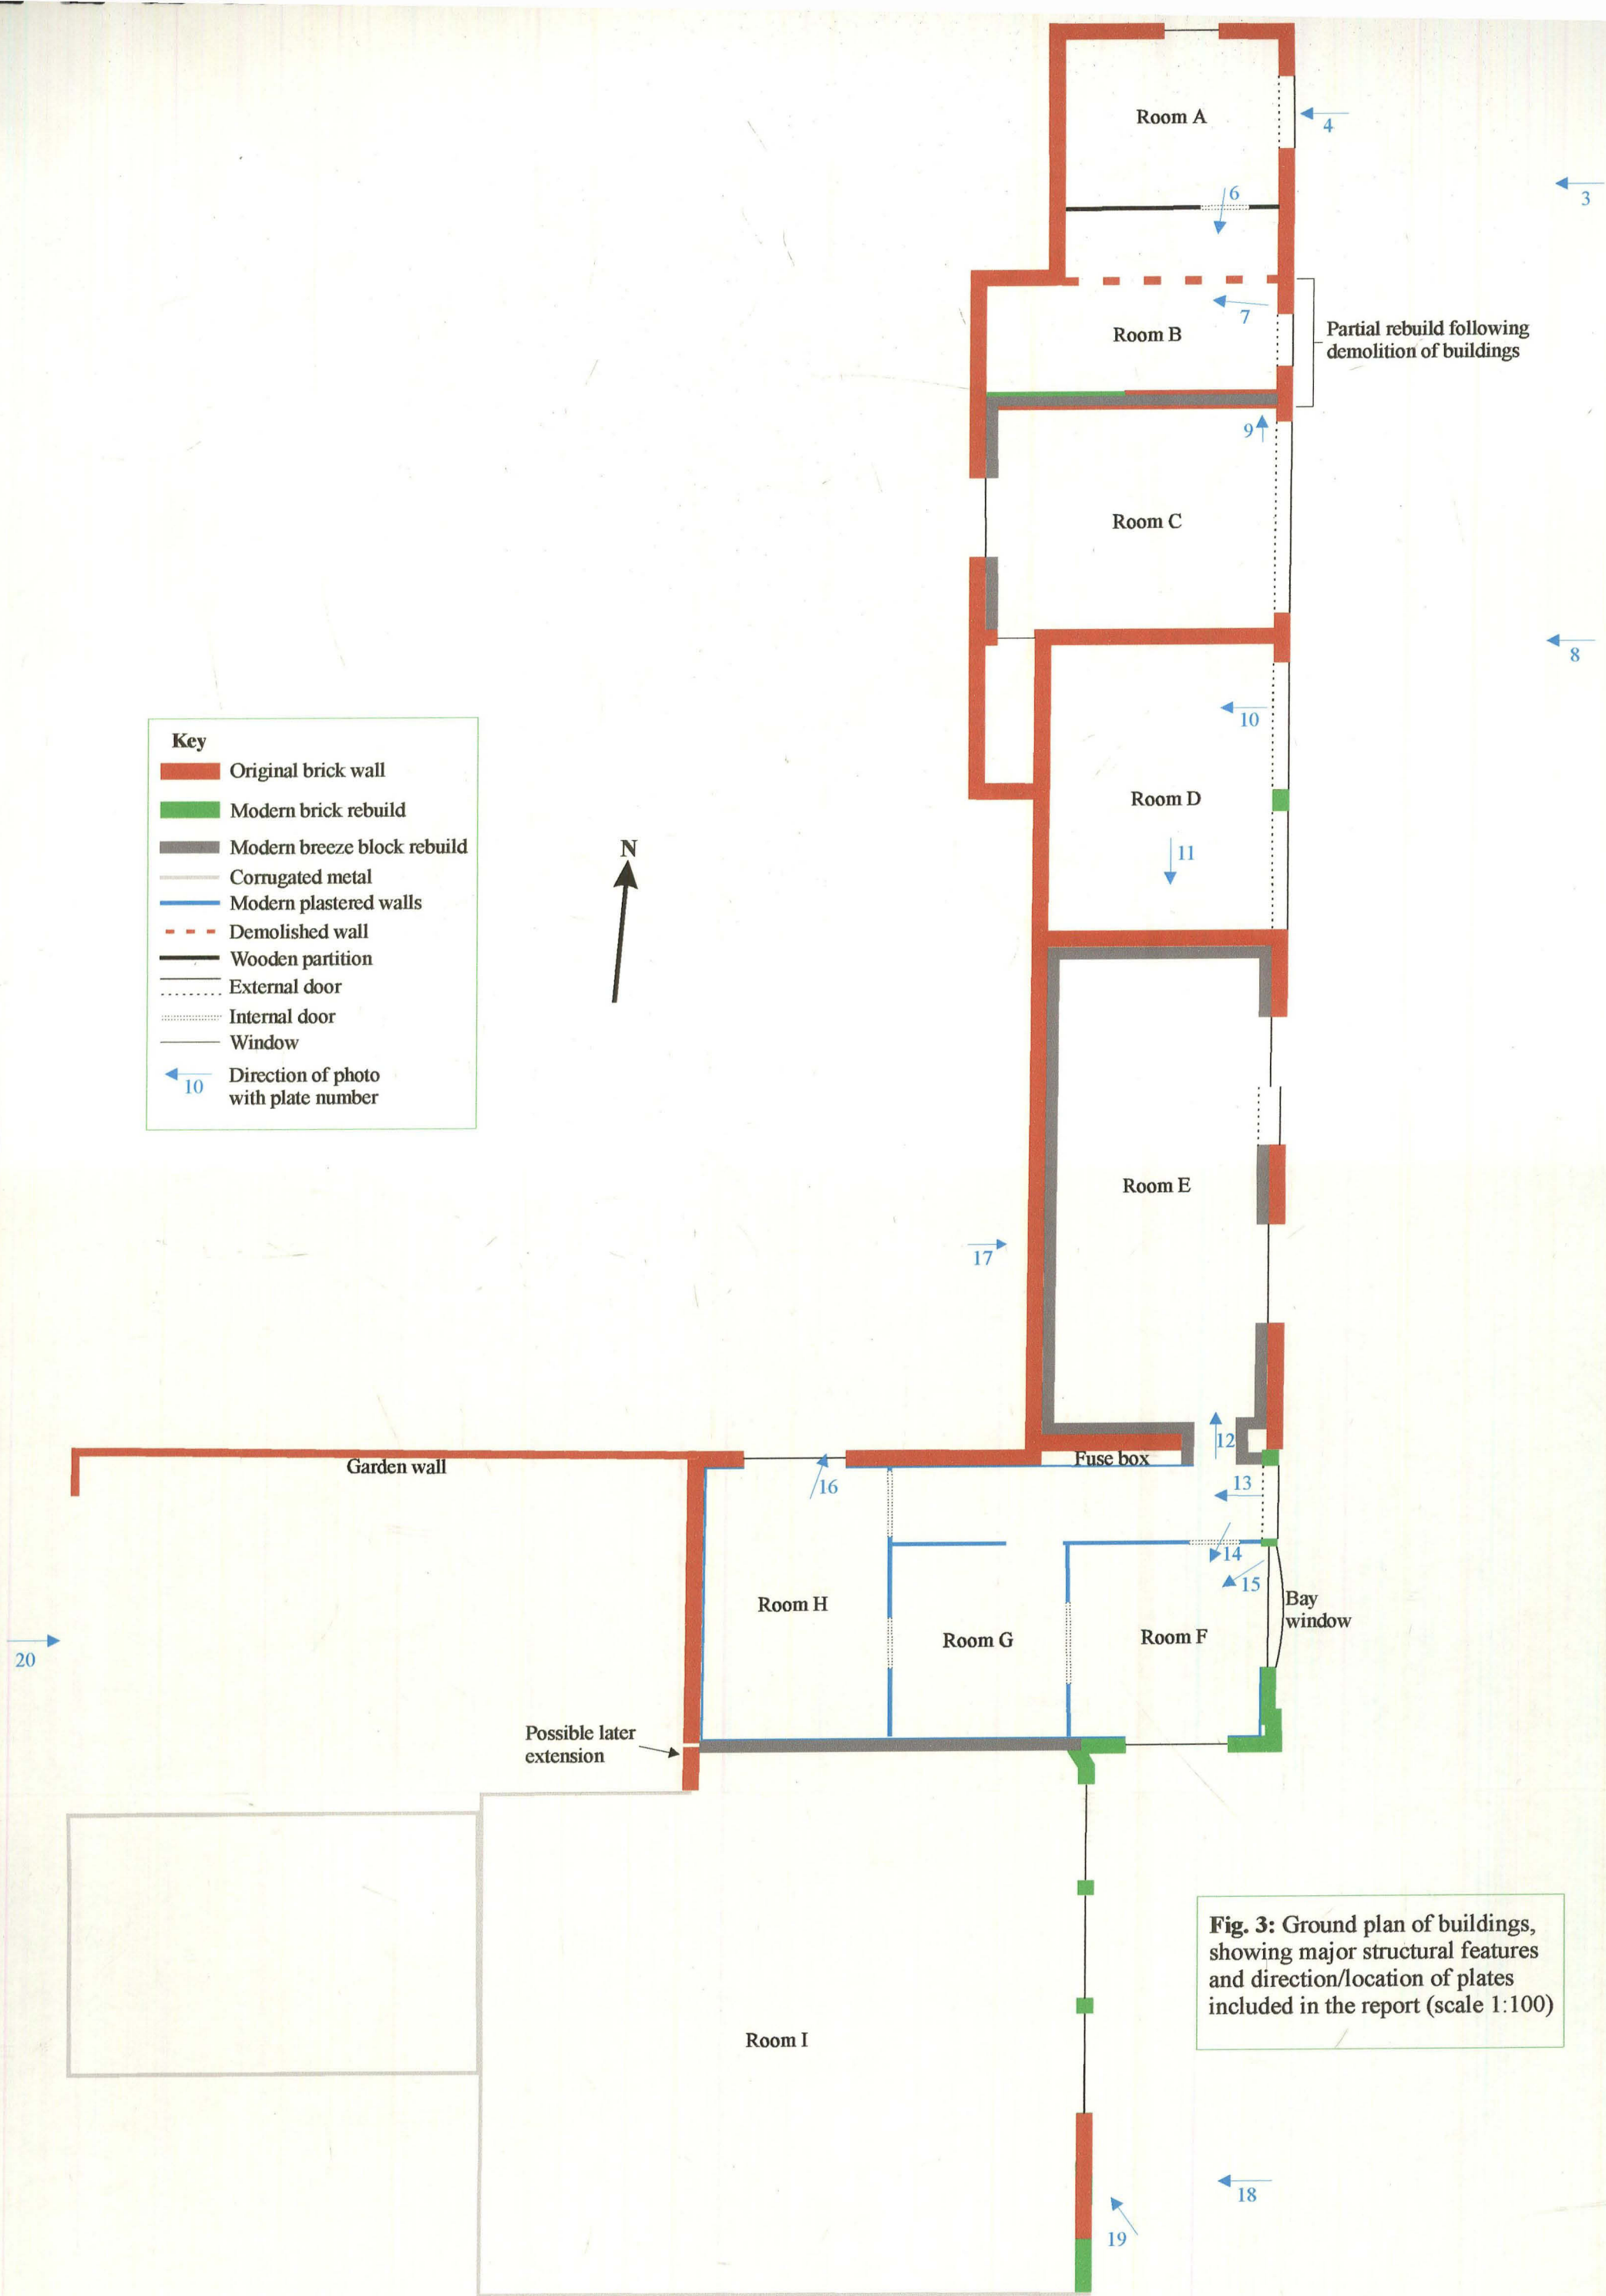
Ground plan of buildings, showing major structural features and direction/location of plates included in the report (scale 1:100)
